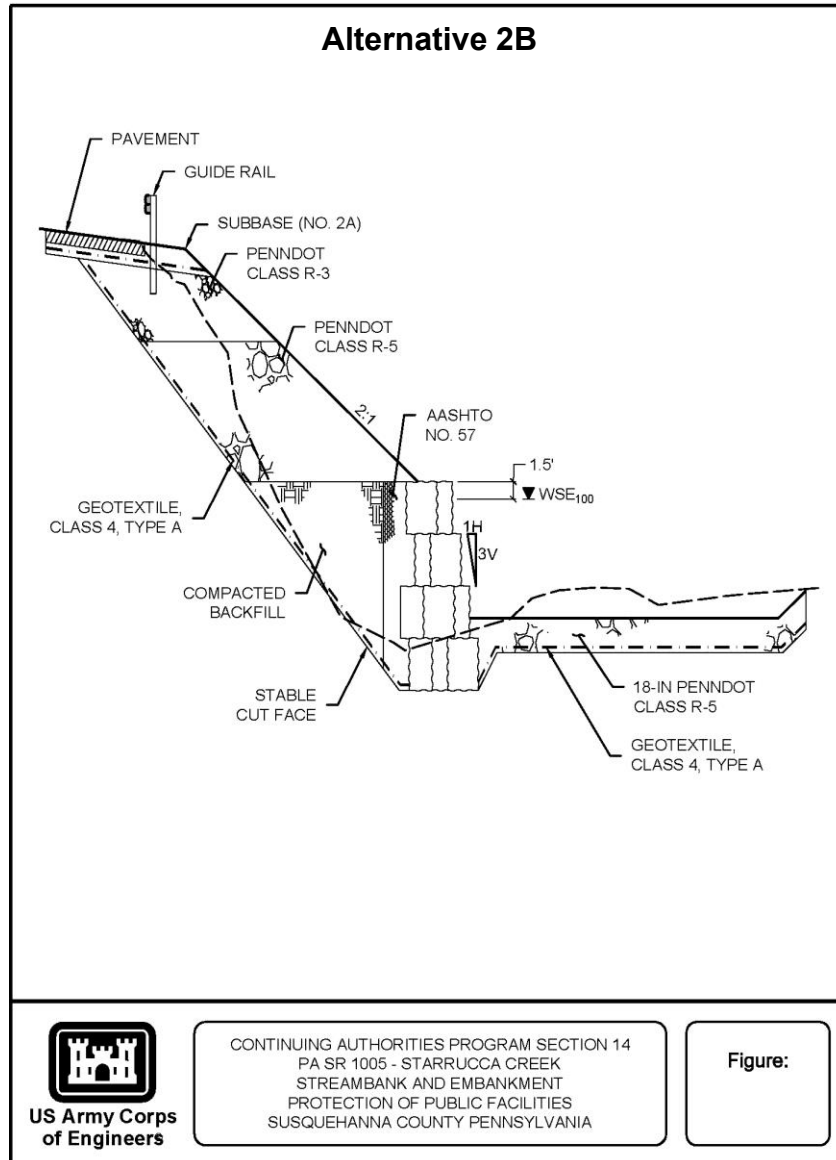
Alternative 2b Starrucca Creek channel modification and streambank stabilization utilizing rip-rap and retaining wall
